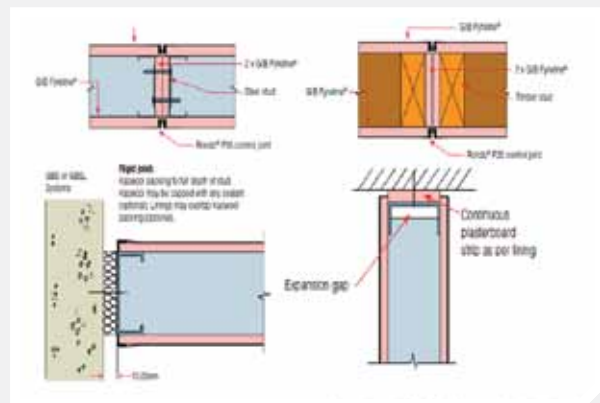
Simple plasterboard jointing details to minimise risk of post-earthquake damage
